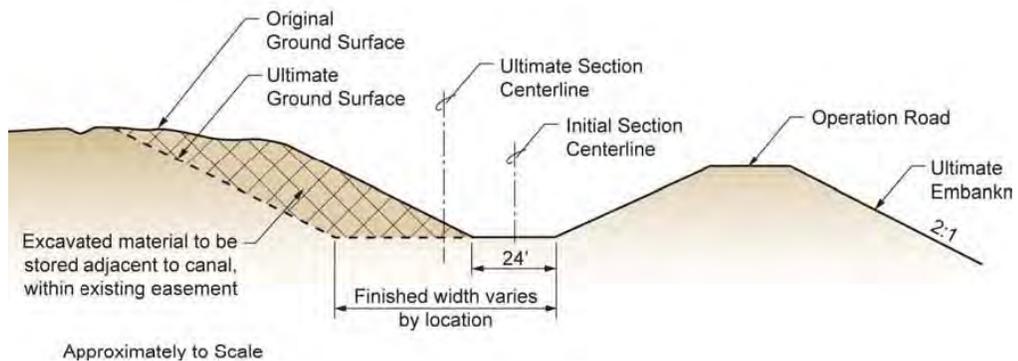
8. East Low Canal Enlargement—Typical Cross Section
